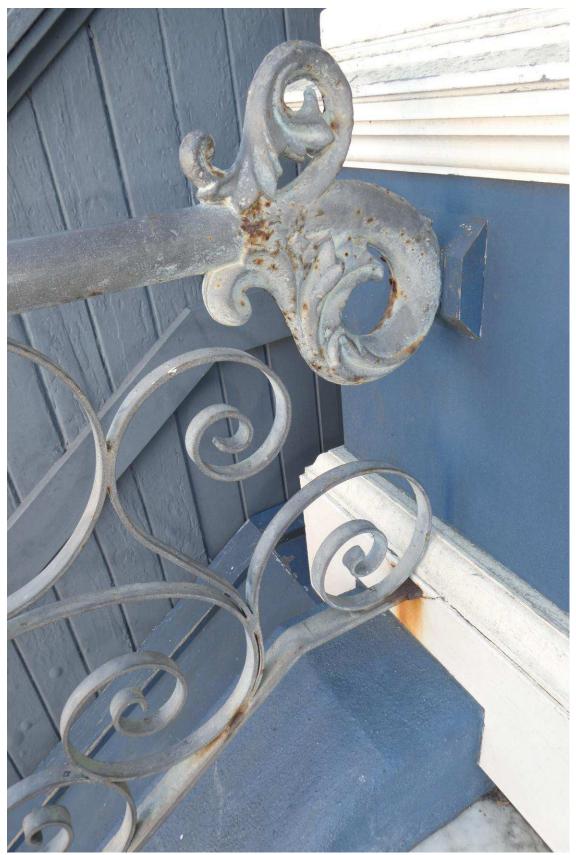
Detail of typical corrosion at the wrought and cast iron stair rail.
